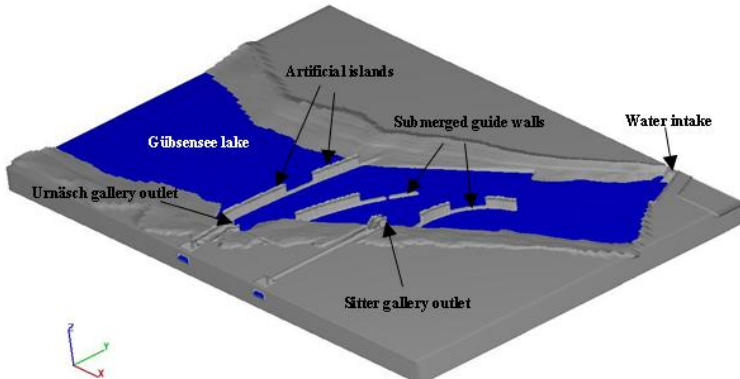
FLOW-3D® model showing the submerged guiding walls combined with the five artificial islands, visible thanks for lowering top water level to 677.7 m a.s.l one meter below the wood submerged guiding walls top level (678.7 m a.s.l).
